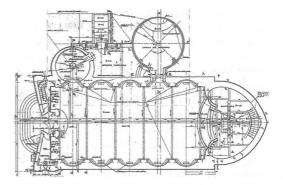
Cross-section of the church of Pont du Suert, looking down the nave. (Source: Torroja archive)
